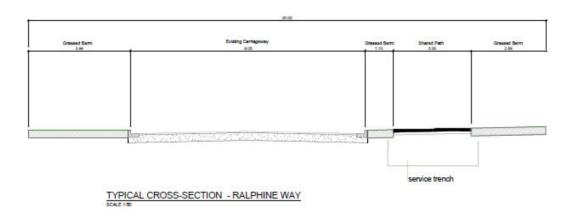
Typical Road Cross Sections. (Source: Davis Oligvie)
